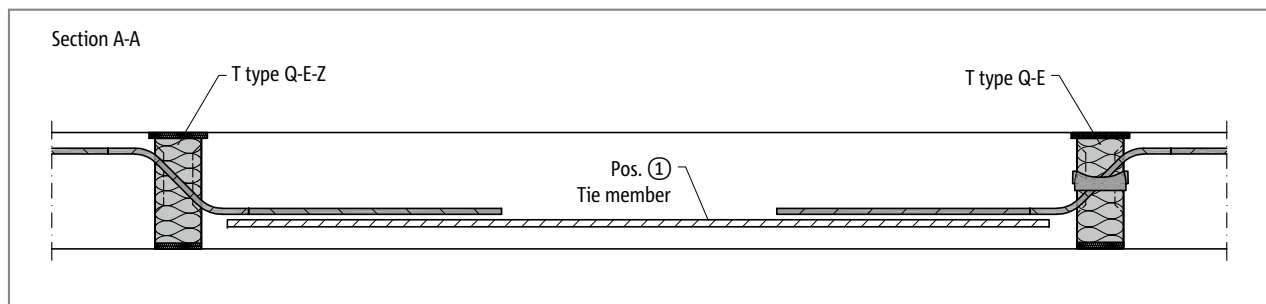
Schöck Isokorb® T type Q-E, Q-E-Z: Section A-A; one-way reinforced concrete slab
